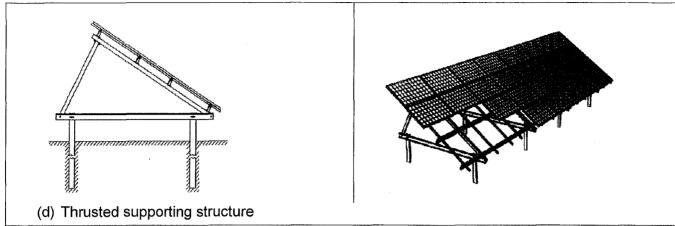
Examples of the anchoring options to be considered for the proposed solar plant (courtesy: Mulilo)
